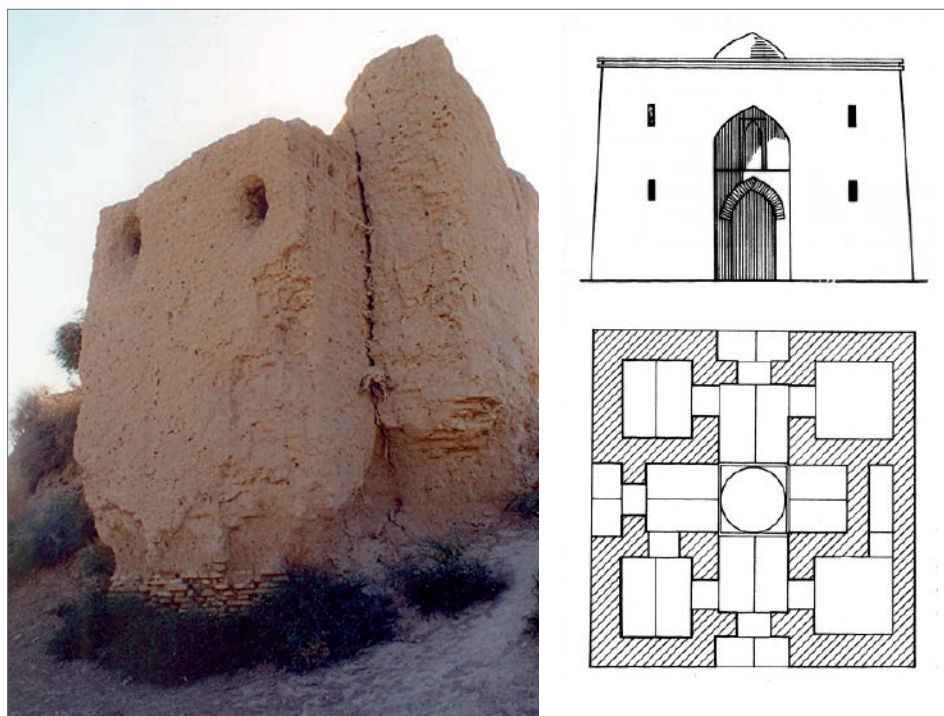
Residential house east of Gyaour Kala: left, view from the outside; right, reconstruction of the facade and plan (Drawing after Albaum, Brentjes 1976: 51, Fig. 14; photo P. Piekarz)
